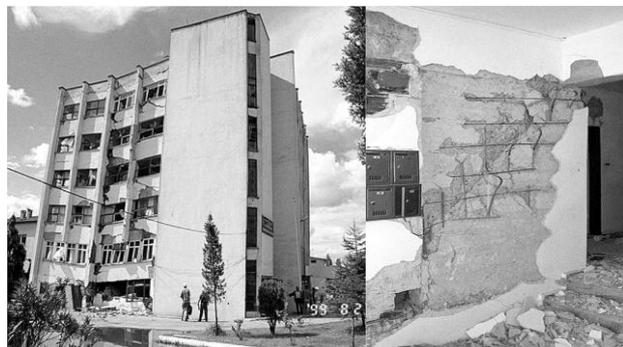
Damages in blade columns or narrow shear walls near stairwells
